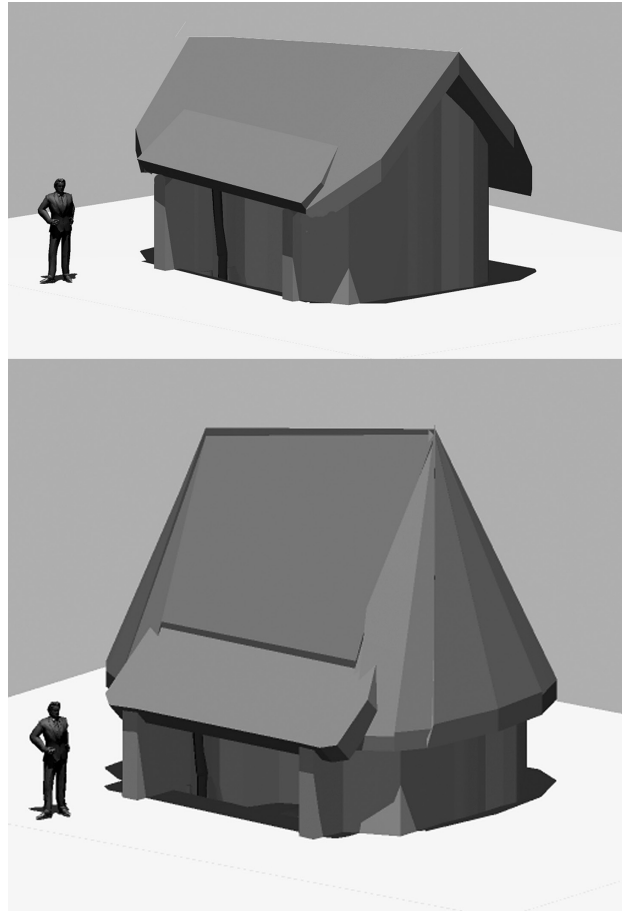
Reconstruction of the house at Ráckeresztúr with gable roof (top) and hipped roof (bottom).
